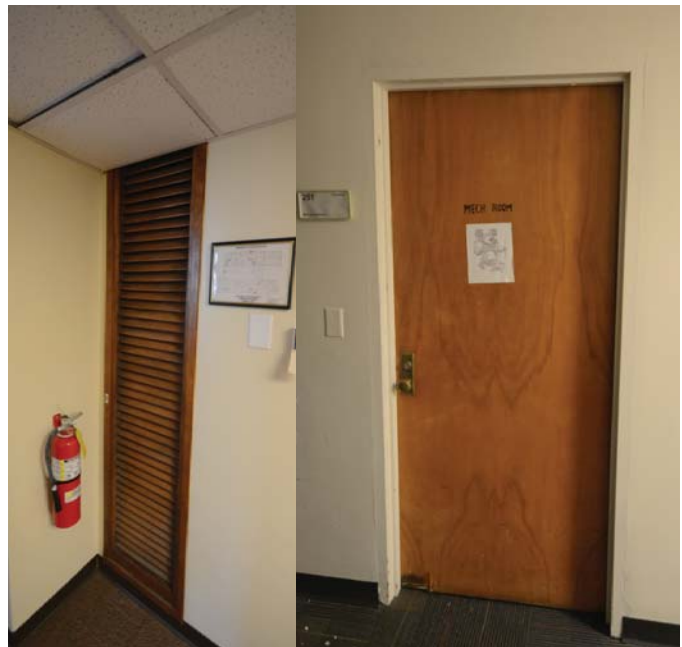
Left; original mechanical louvered panel on the second floor of Old Rich and right; an original wood slab doors in the Calculator Building.
